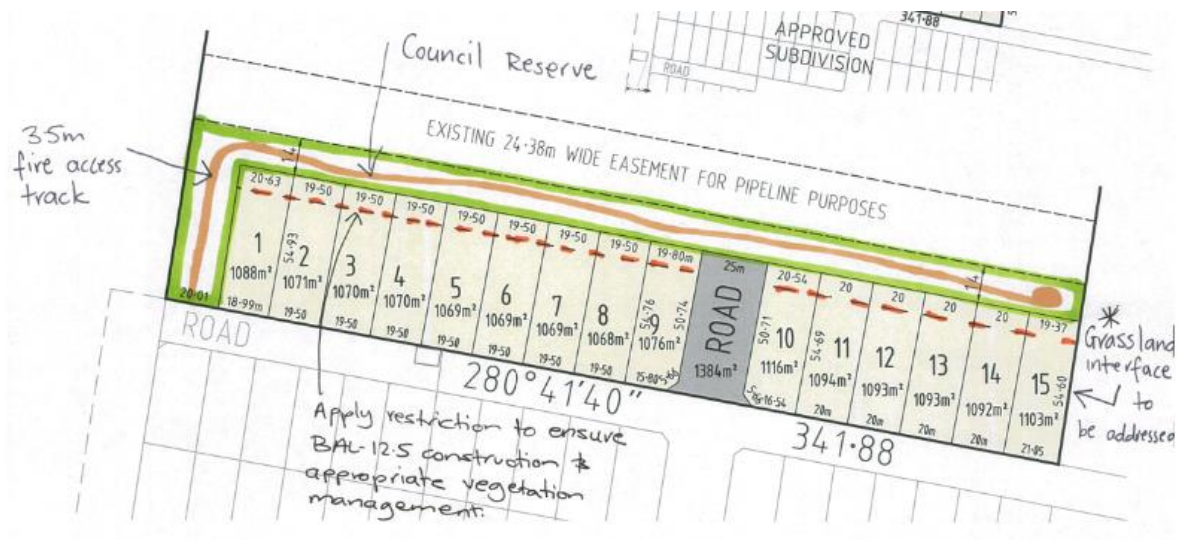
Sketch Plan - 50 Glendale Rd and 110A Marshalls Road
